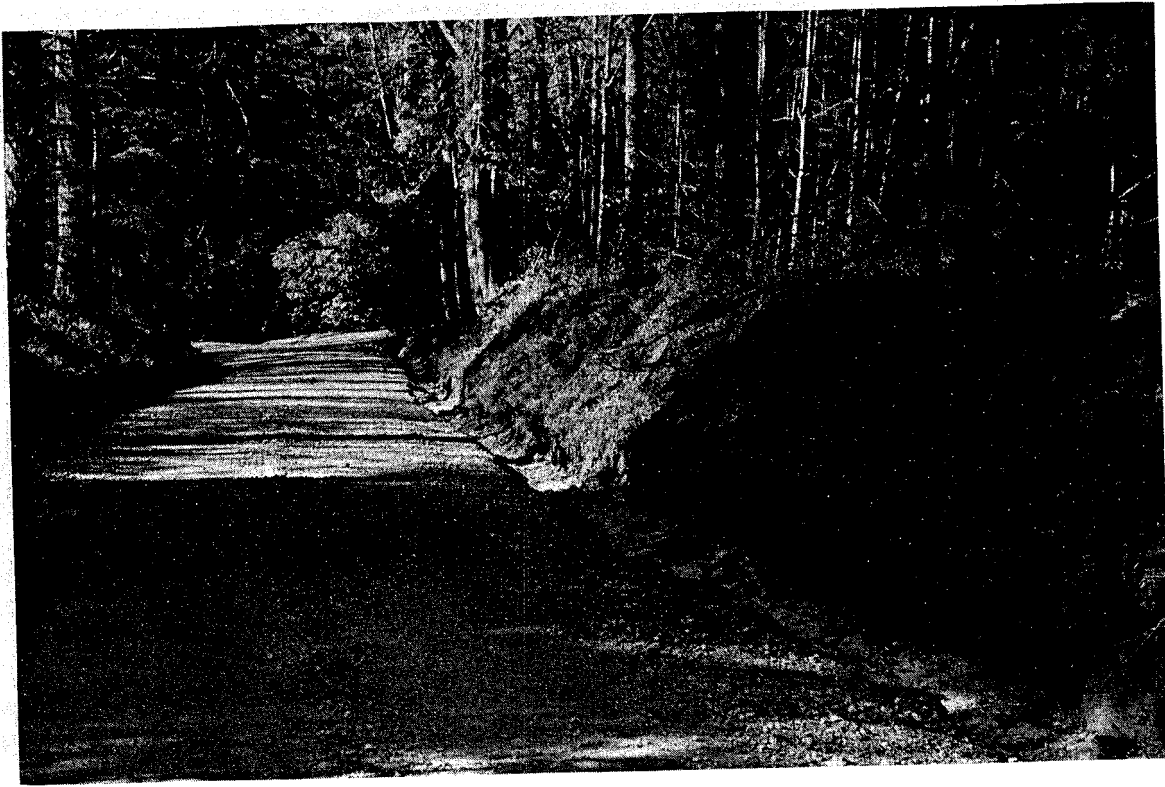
Roadside ditches are sources of sediment when cut banks slump and when road surface materials are washed into ditches.
